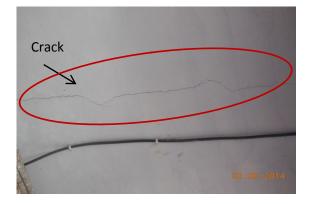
Horizontal Crack on Vrandah Roof of Shop No. 773-3, Ground Floor,Approx. Width = 0.60mm,Approx. Length = 1.8m. Distance from Right Hand Column = 0m,Height from Floor =3.00m.
